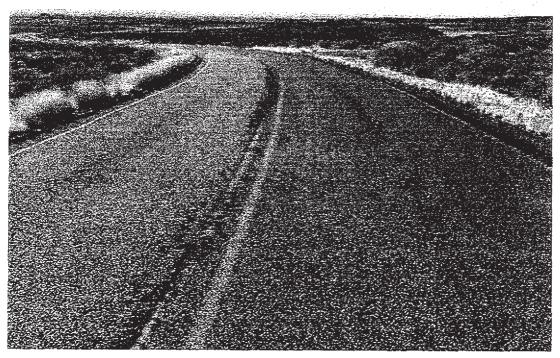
MP 4.18 - Typical Pavement Section, Note Raveling of Chipseal
